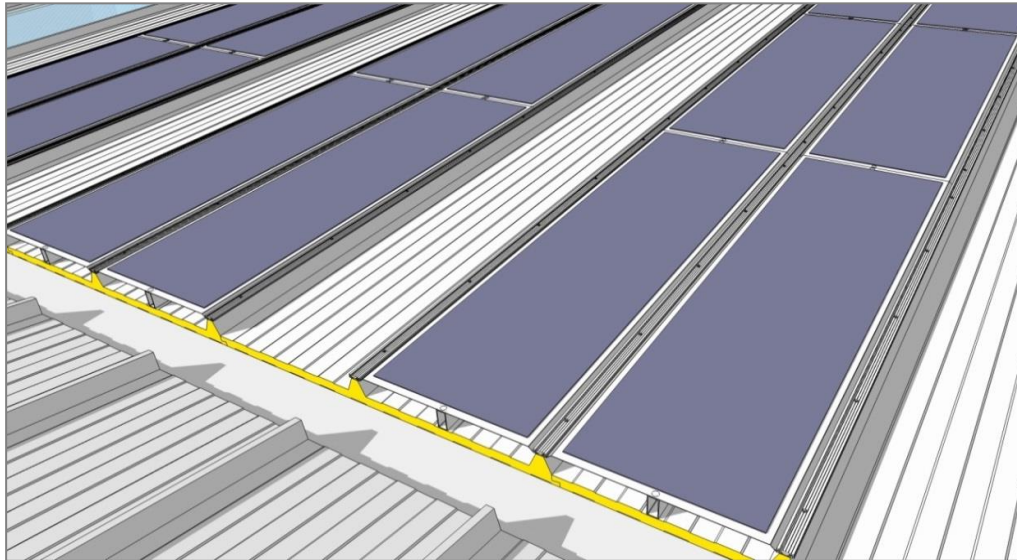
Standard sandwich-panel section currently installed in the CRICURSA roof
